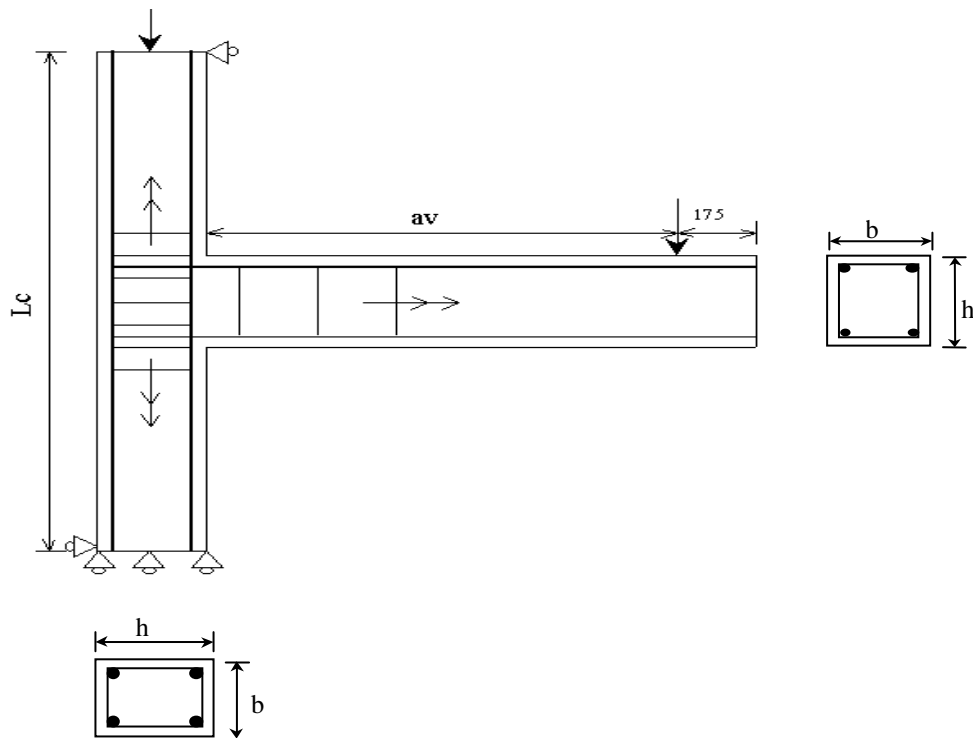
Experimental corner beam-column joint specimen (Sarsam (1983))
